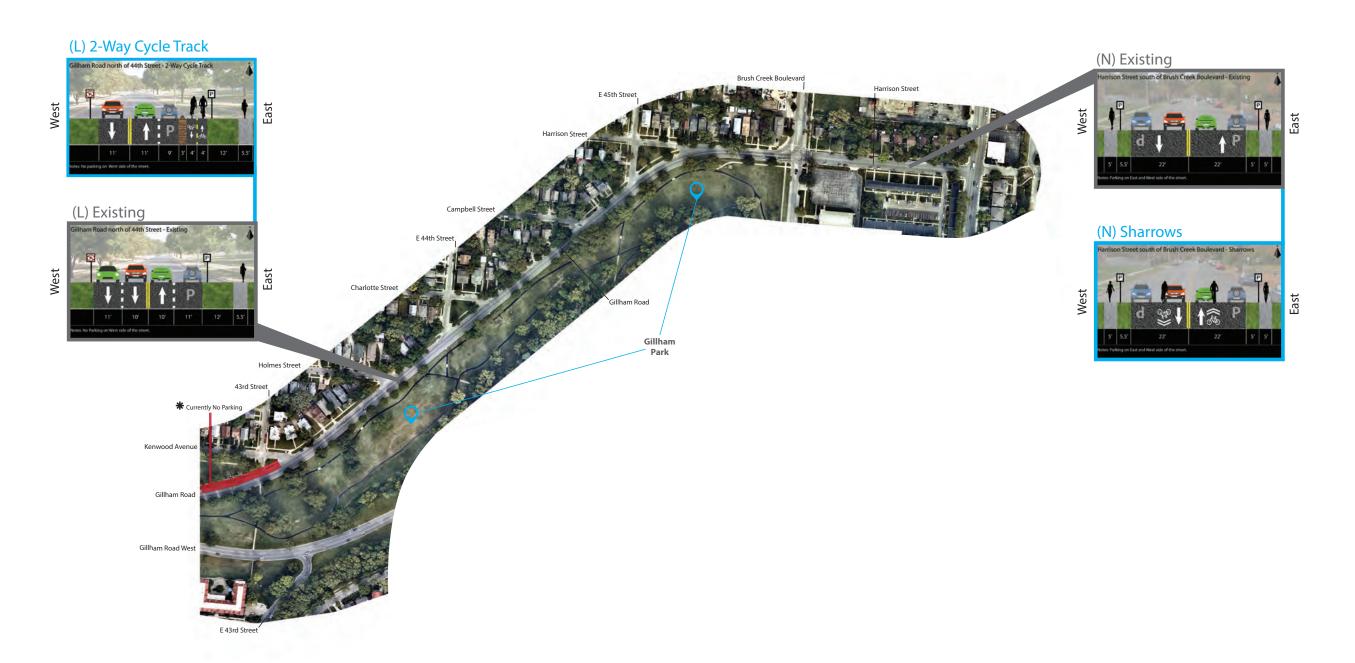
Gillham Road and Armour Boulevard to Gillham Road and 42nd Street
